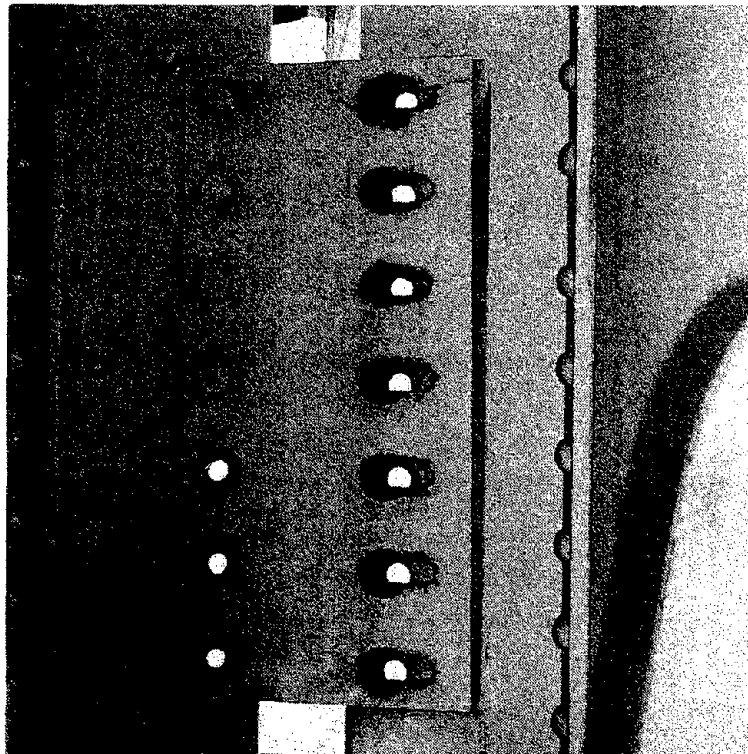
Device where all bolts were cut in one side (Hatsune Bridge)
